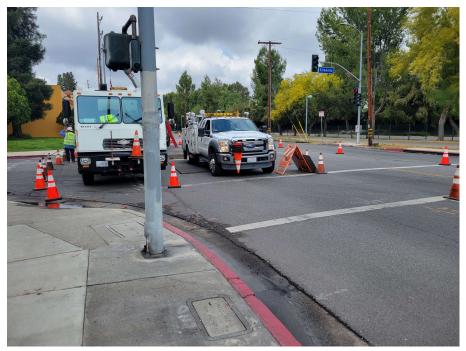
Overview of an underground section being repaired at West Oxnard Street and Etiwanda Avenue, view to west, April 28, 2022
